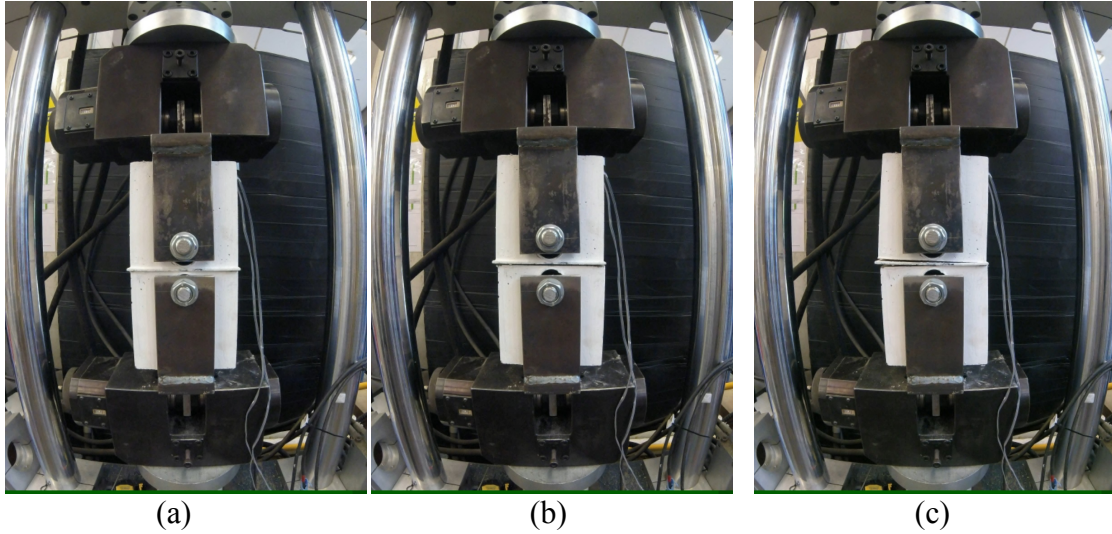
Time lapse of loading to failure – specimen L3.1: a) pre-loading (0.3kN, 0 sec); b) pre-failure (17kN, 608 sec); c) post-failure (0.4kN, 610 sec).
